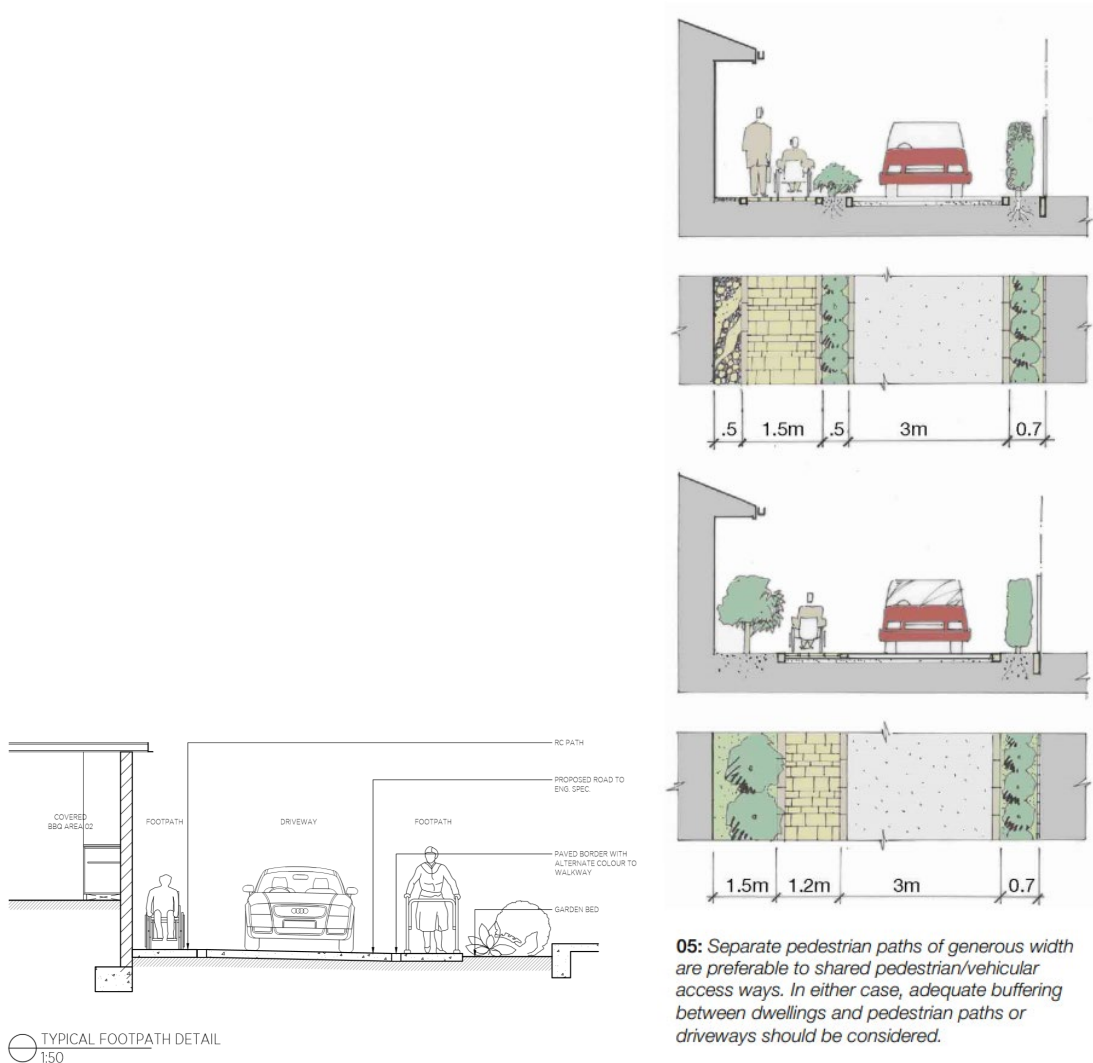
, 9 & 10 – (Left) Detailed Sectional View of the Driveway Detail, (Right) and recommended driveway section as proposed in the “Seniors Living Policy Urban Design Guidelines for Infill Development”
